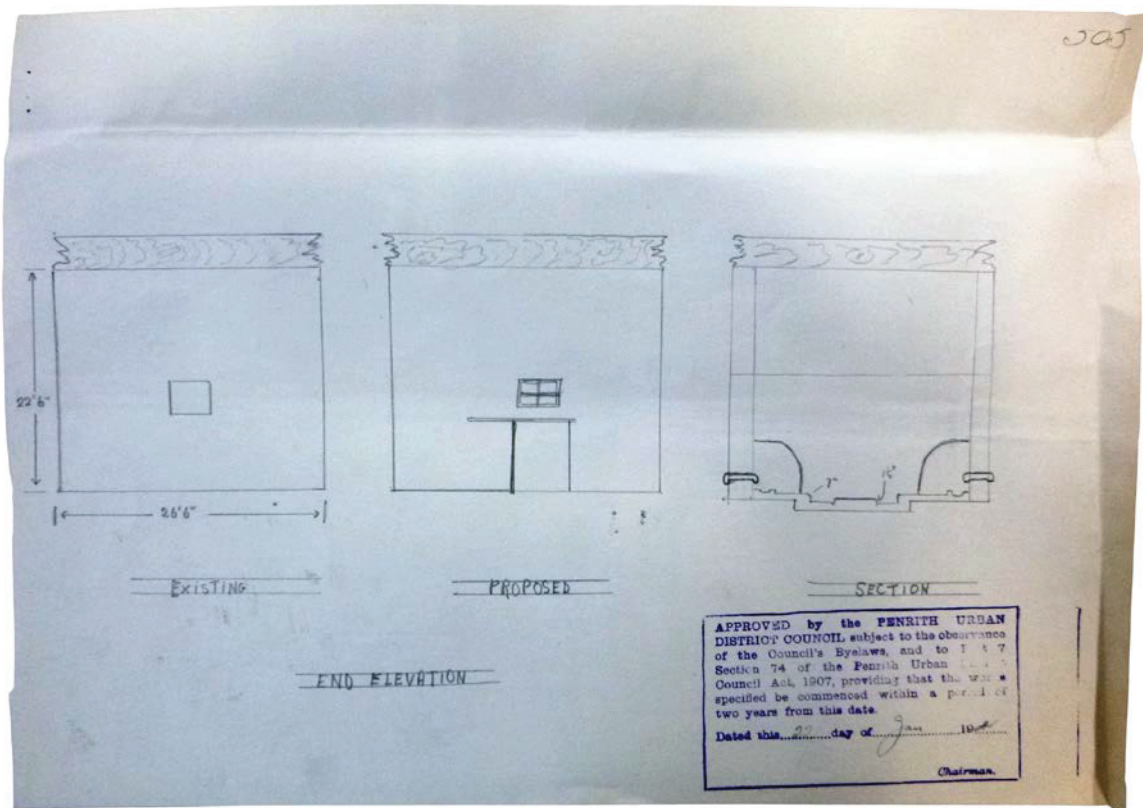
Existing and proposed elevations and section relating to buildings at White Ox Farm, 1941
